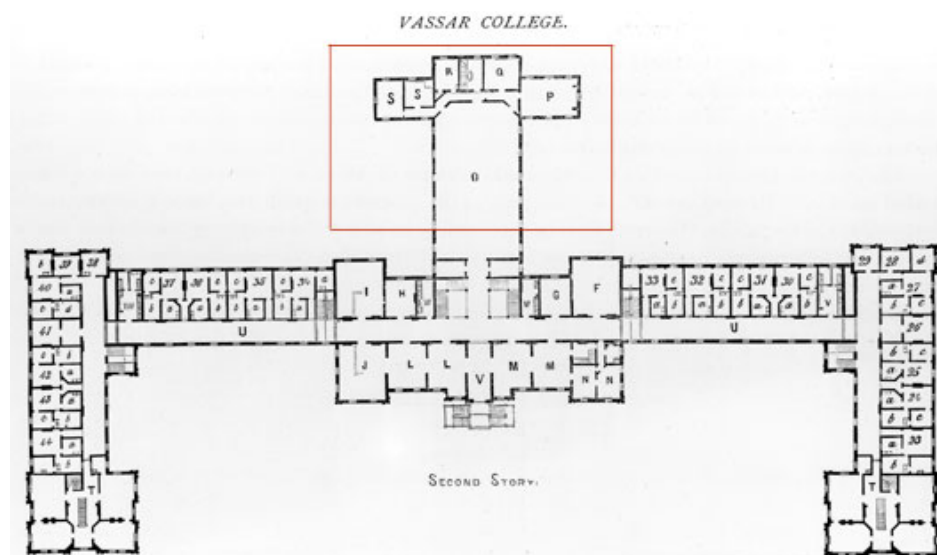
Original plan for the second story of Main Building at Vassar College. Image reprinted from A. Marvar (2011).
